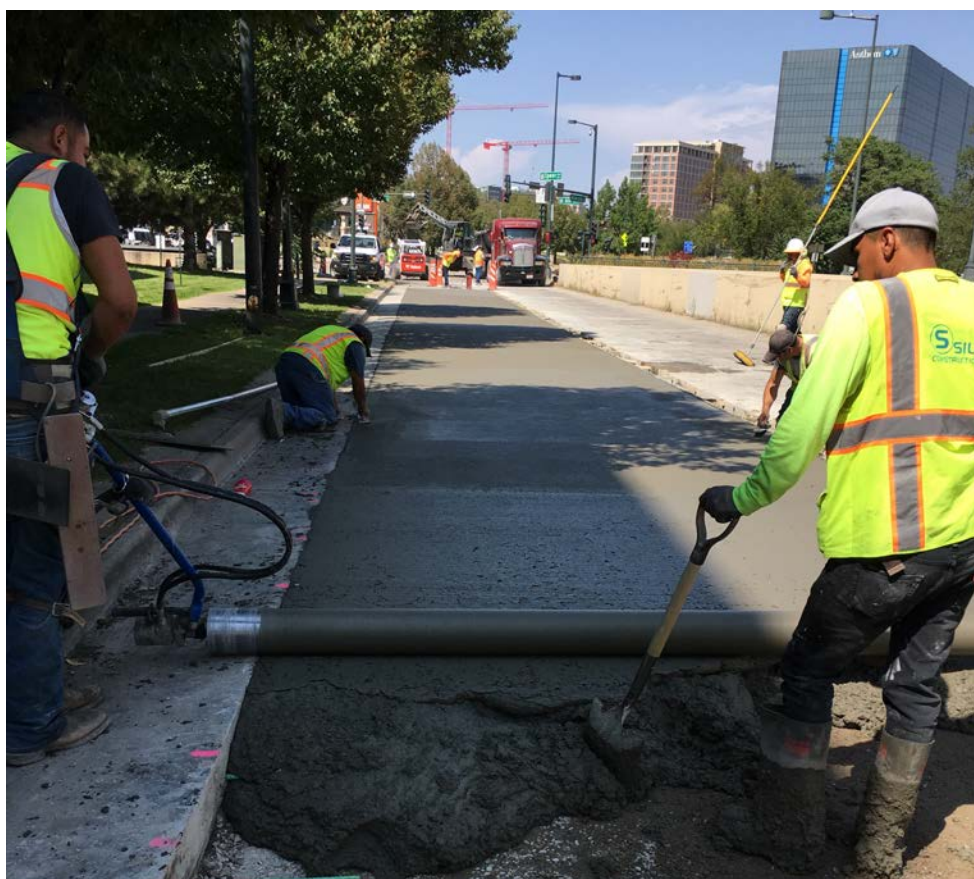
One of Two New Trial Sections of Concrete Pavement
